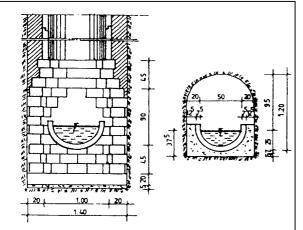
Protection of shafts with brick, masonry and gallery section with semi-circle concrete conduits
